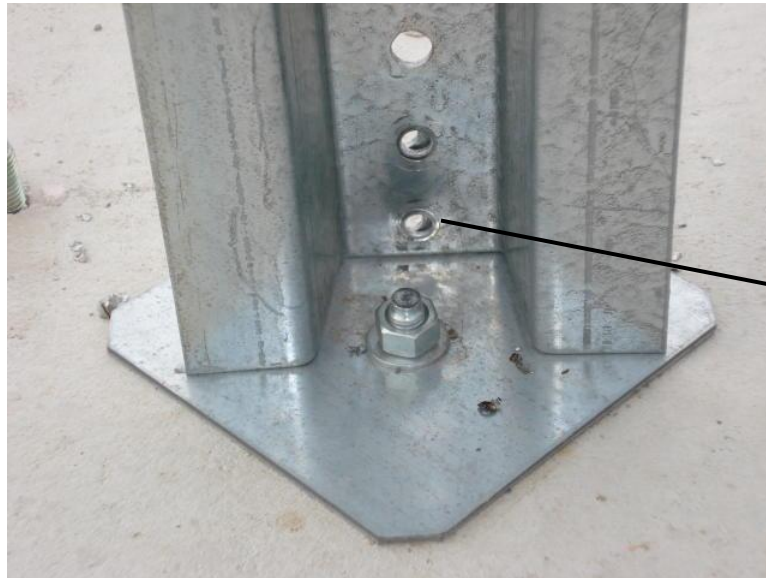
A FINISHED 'A' FRAME INSTALLATION
